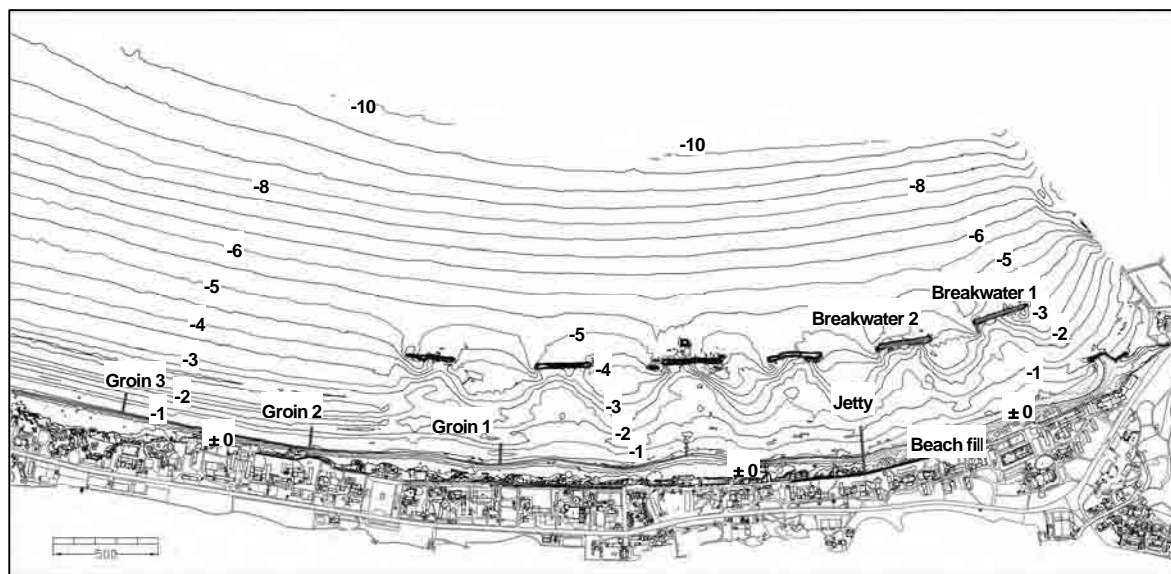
Layout of the shore protection facilities around Mamaia Sud
